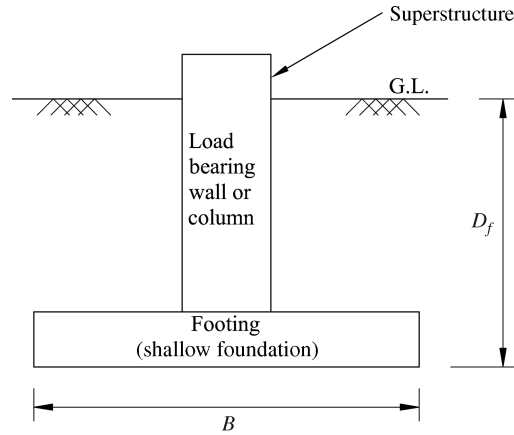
Shallow foundation ($D_f/B \leq 1$).
